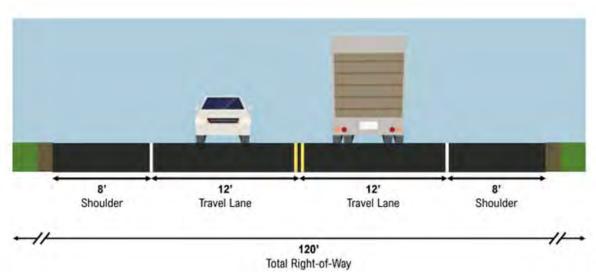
SR 3 Freight Corridor – New Alignment Proposed Highway Cross Section
